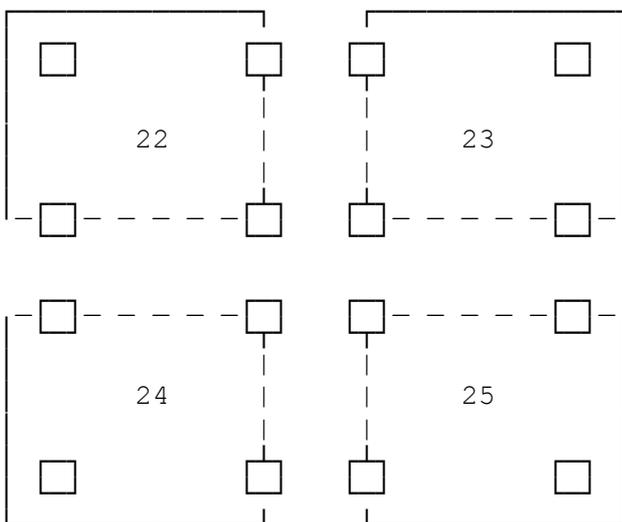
(c) - Flat slab panels with two cantilever edges
